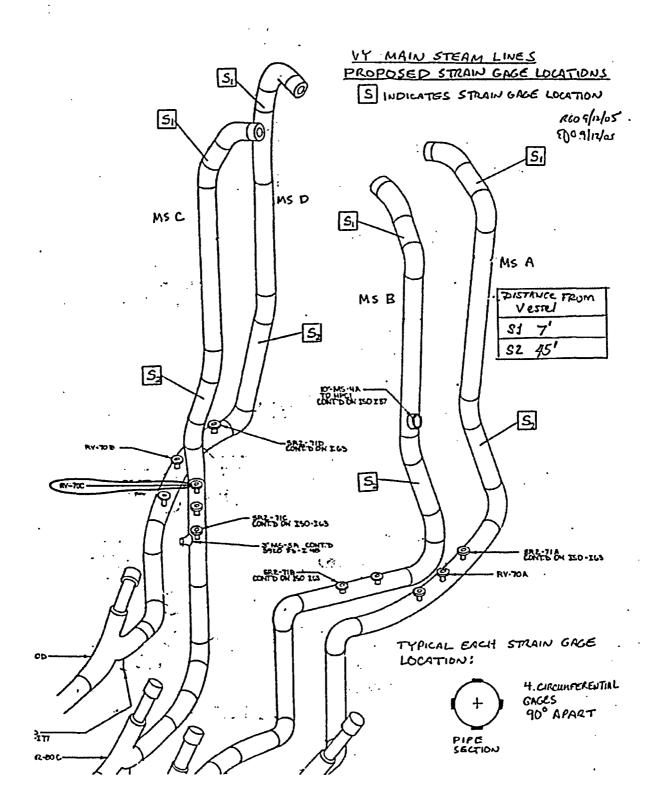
Sheet 2: VYNPS Main Steam Piping Cavities and ACM Measurement Locations
